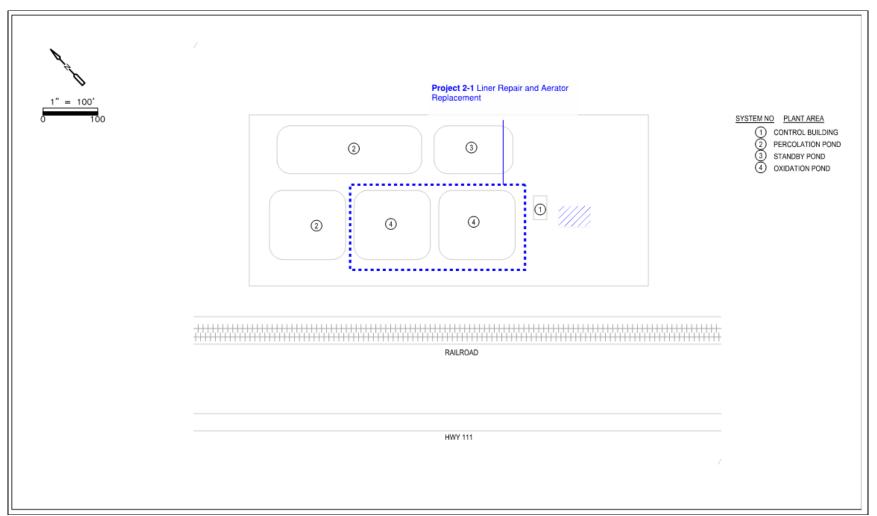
WRP 2 Existing Site Plan and Proposed Improvements
